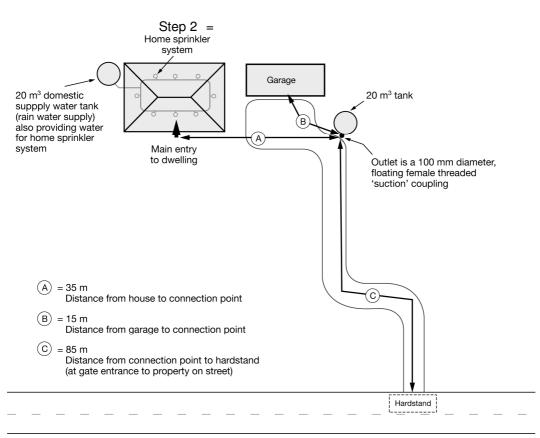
Firefighting water supply requirements for a sprinklered house with no access to a reticulated water supply
